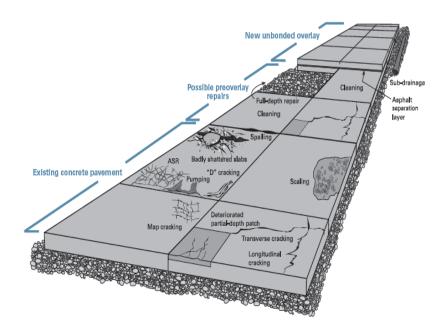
Notable distress on existing pavement and possible repairs for UBCOs [4]
